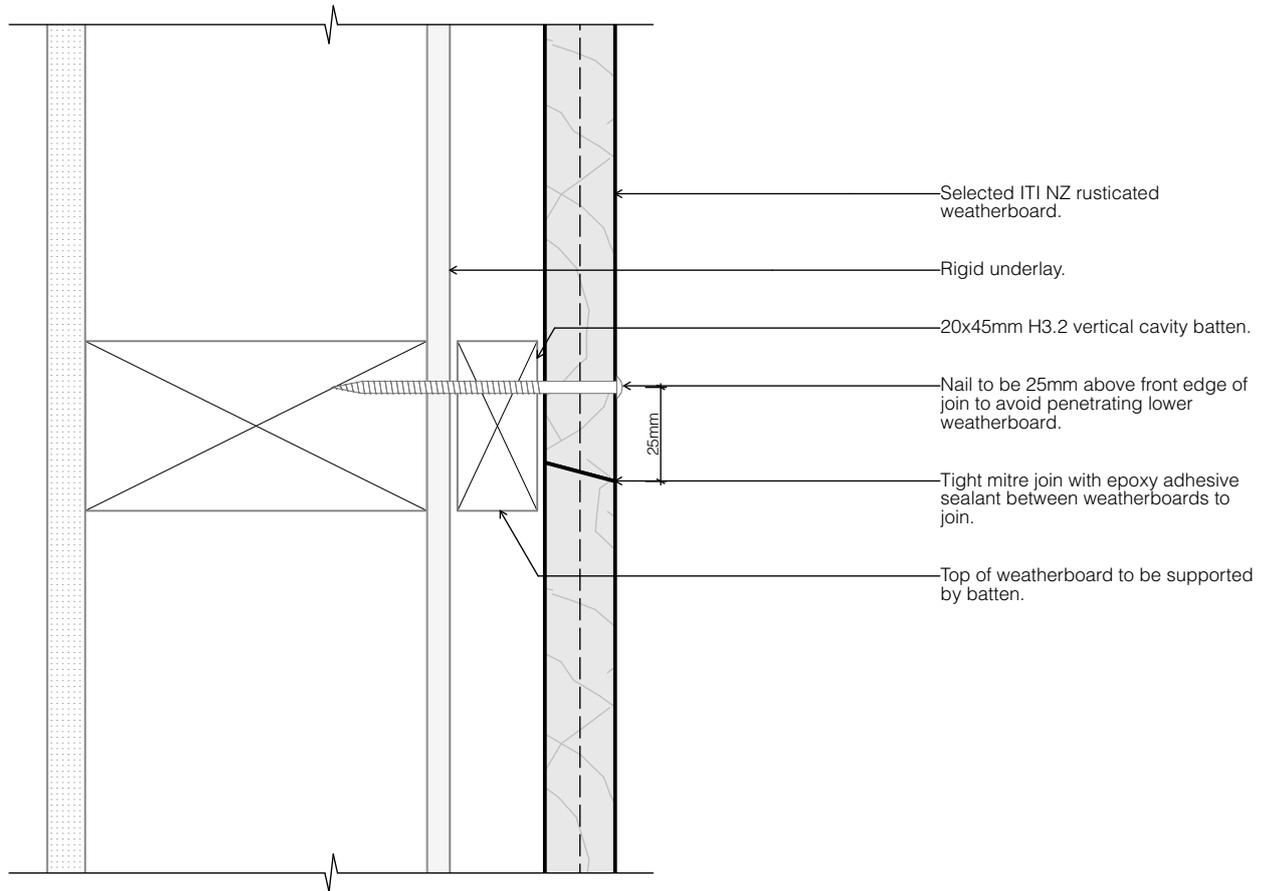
101 FIXING DETAIL STANDARD CAVITY – PAINT FINISH
